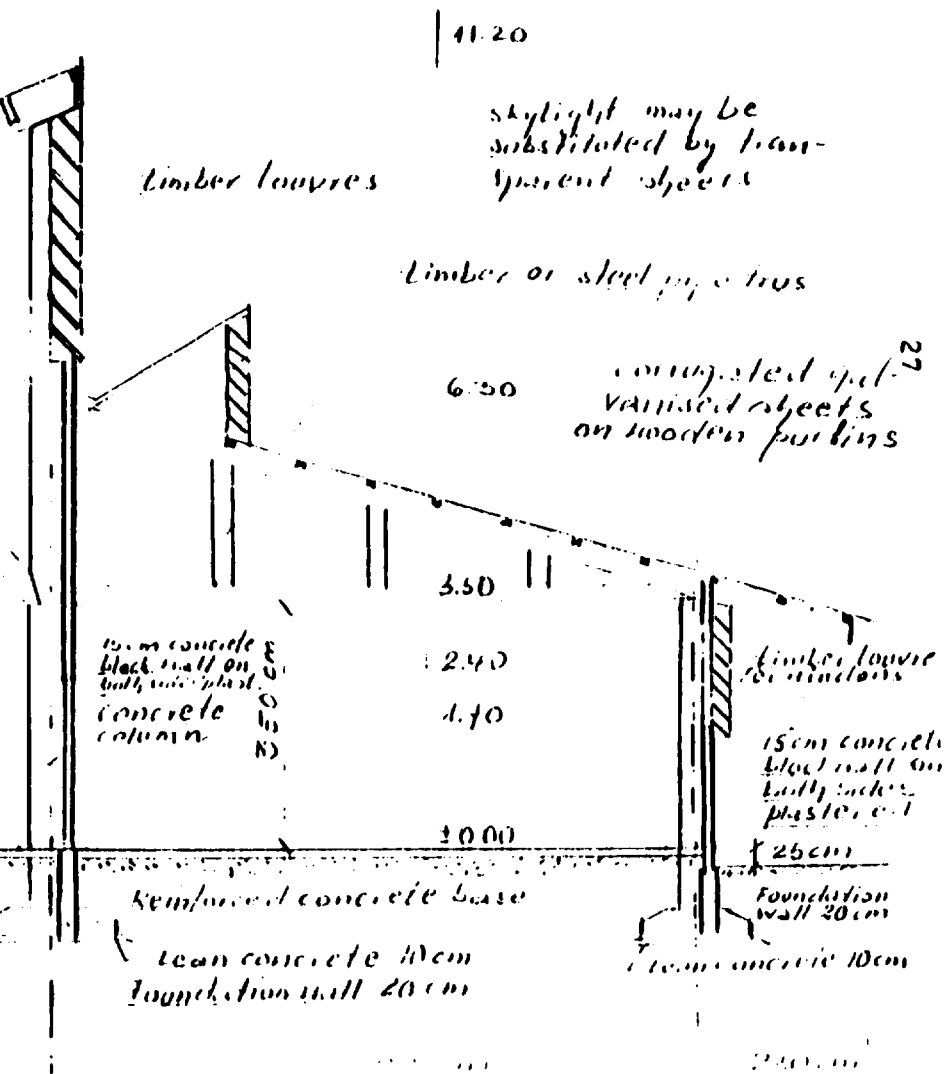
Sketch of the structural solution of the boat building and repair hall.
